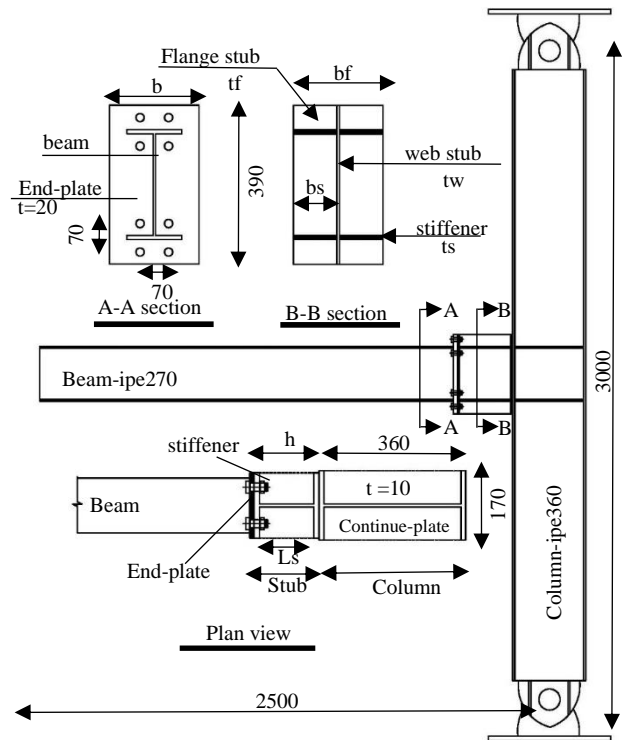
Typical details of proposed connection model(II): (unit: mm)
